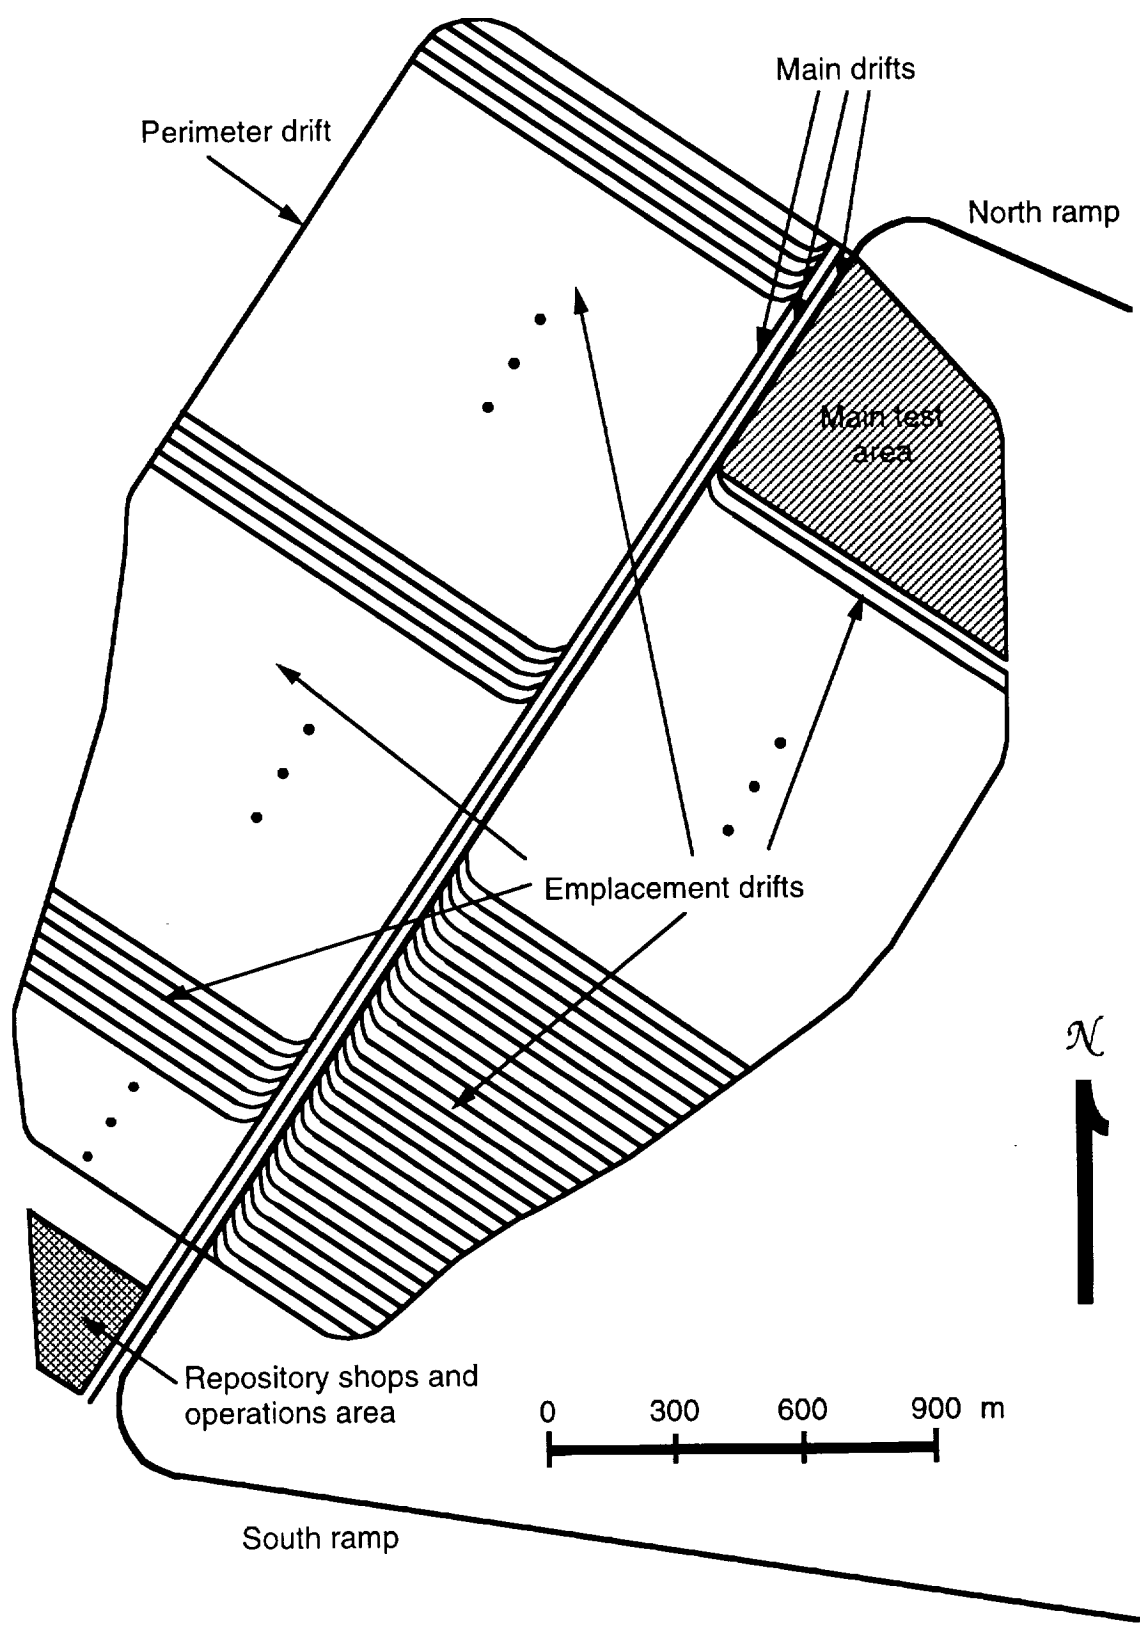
Alternative repository layout based on tunnel-boring machine construction.
